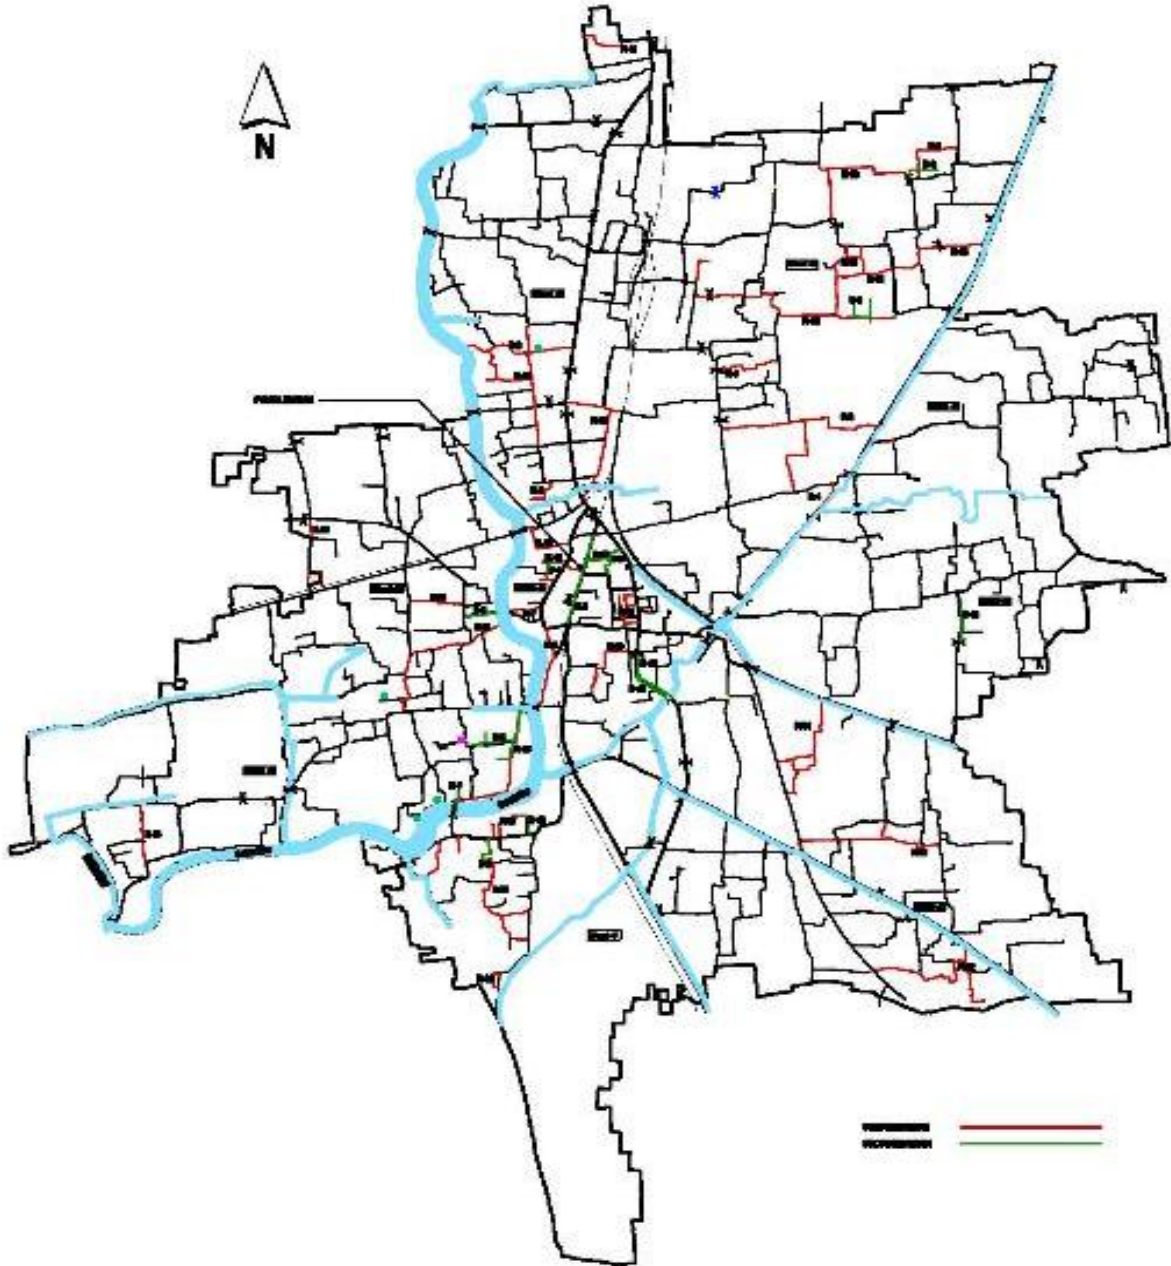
Proposed Roads and Drainage Improvement Under UGIIP III
